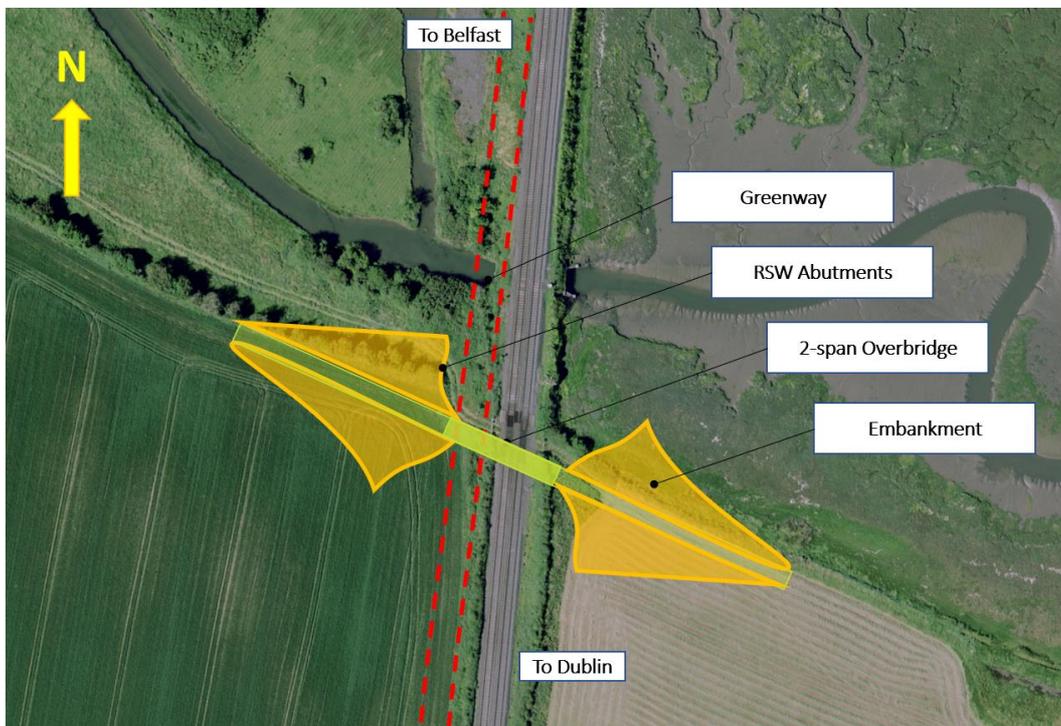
Level cross option 5 overbridge layout sketch (Source: OSI aerial mapping)
